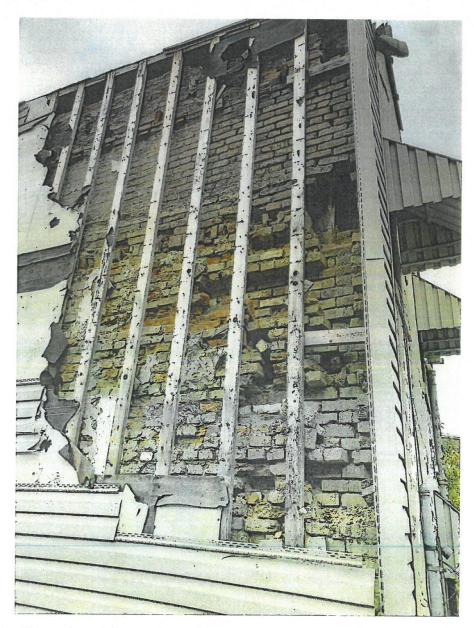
Closer view of the Northeast side of the dwelling and the extent of brick and mortar deterioration.
